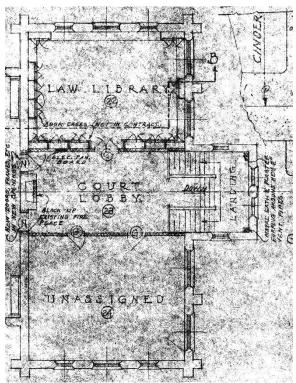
, Fredericksburg Courthouse, Detail, South wing, second floor. J. Binford Walford & O. Pendleton Wright, Renovation drawings, 1948. Courtesy City of Fredericksburg.
